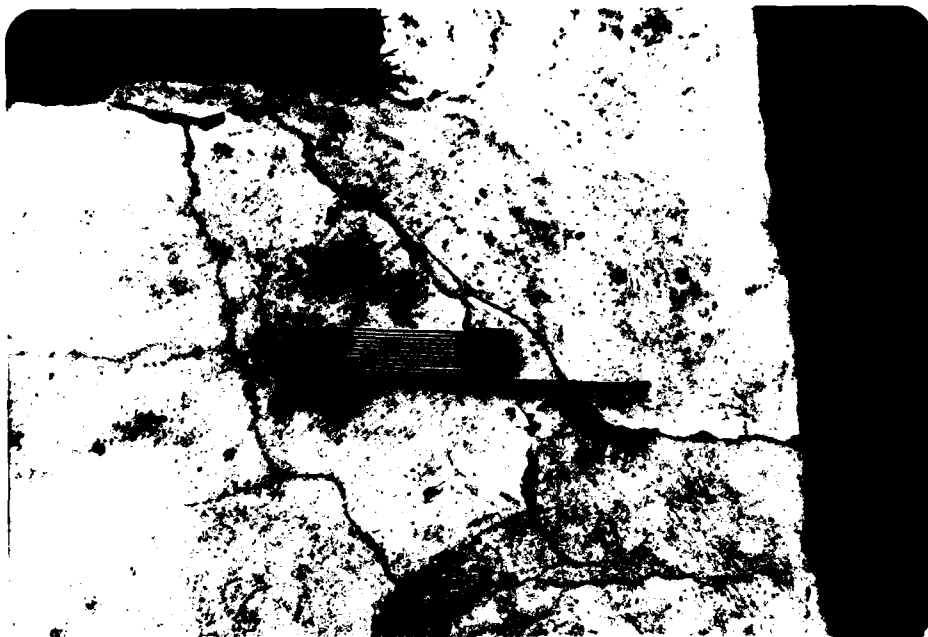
Crack through training wall which divides the spillway discharge channels.
